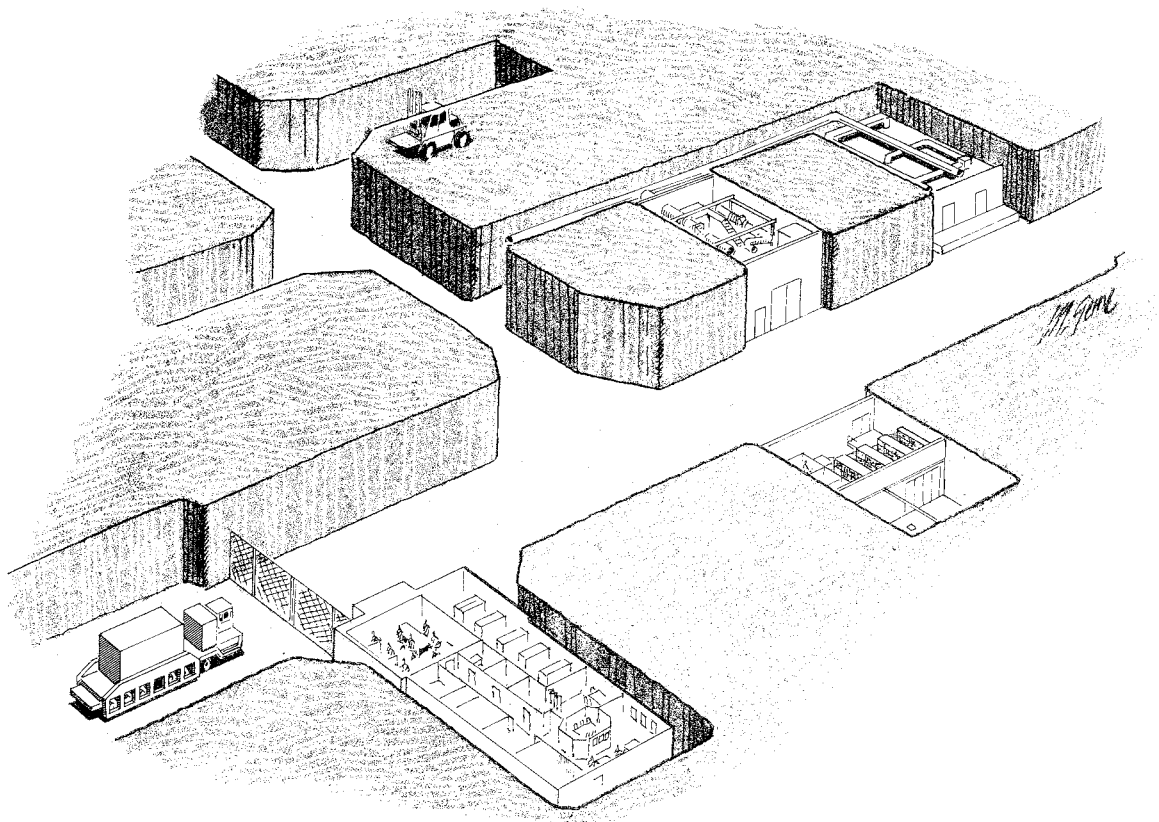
Central part of underground facilities with the operational building and three small buildings for auxiliary systems and maintenance work.
